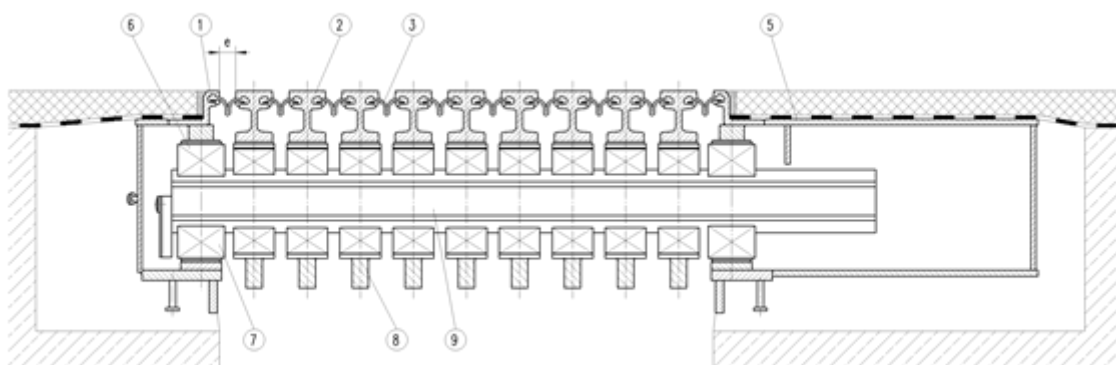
Cross section at carriageway with crossbeam of single crossbeam modular expansion joint with kinematic guidance
